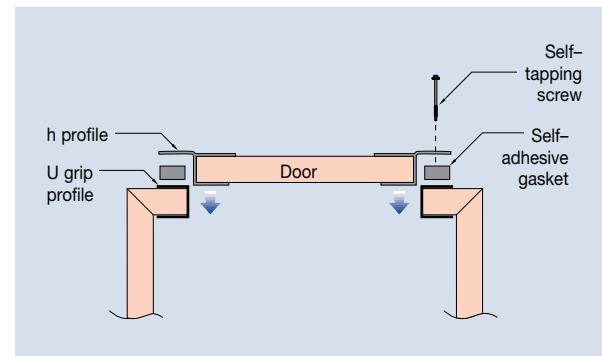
Kingspan KoolDuct®* Panel Access Door
